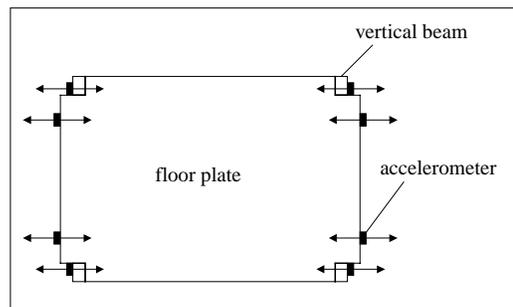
Top view of a floor plate showing typical location and orientation of accelerometers
